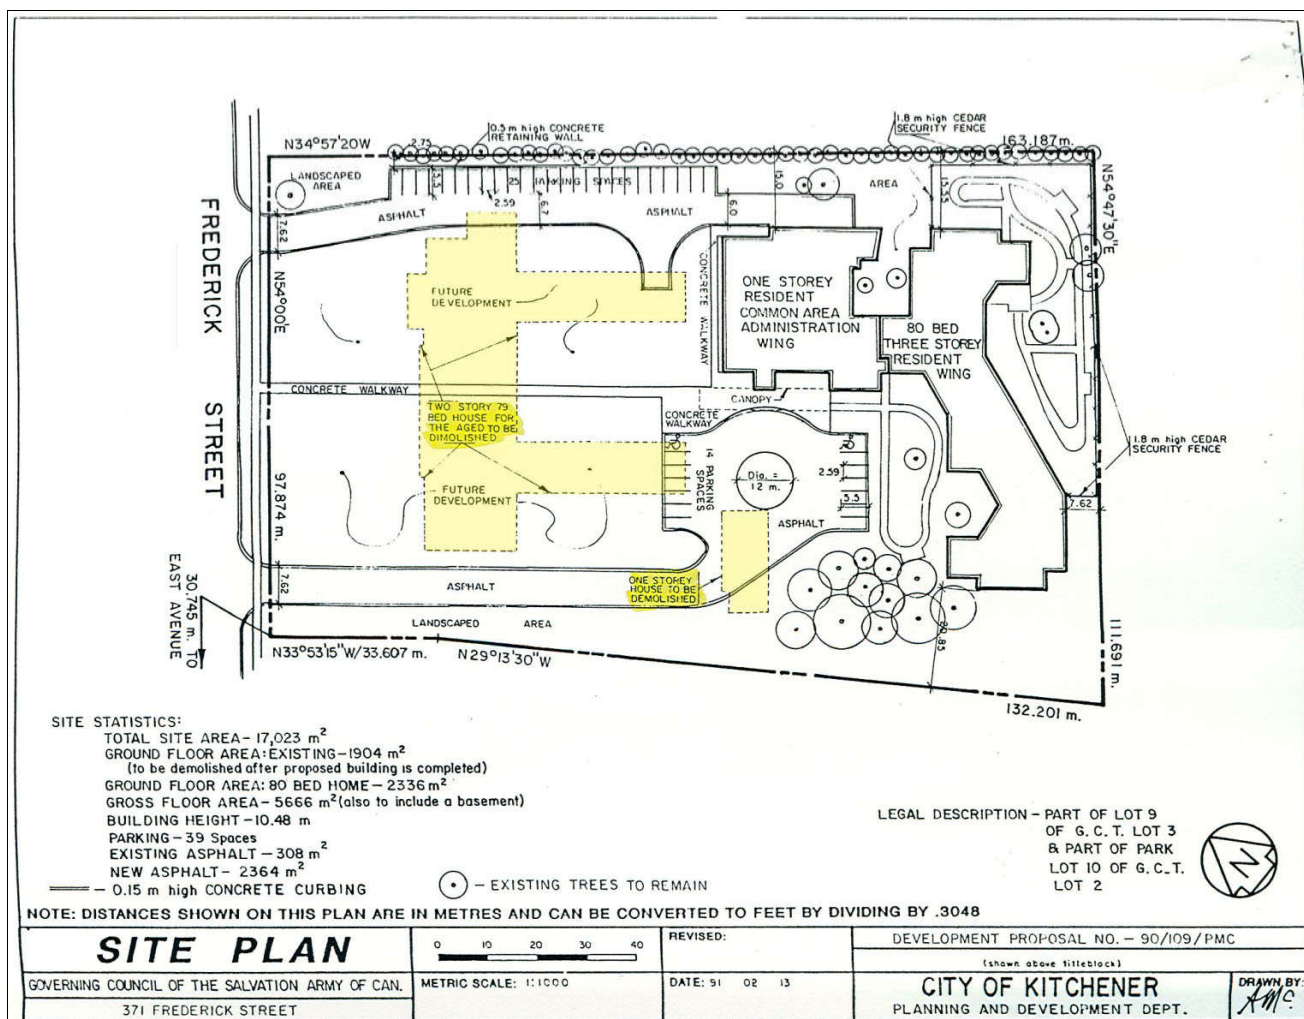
Site Plan, Governing Council of the Salvation Army of Canada, 371 Frederick Street, 91-02-13
